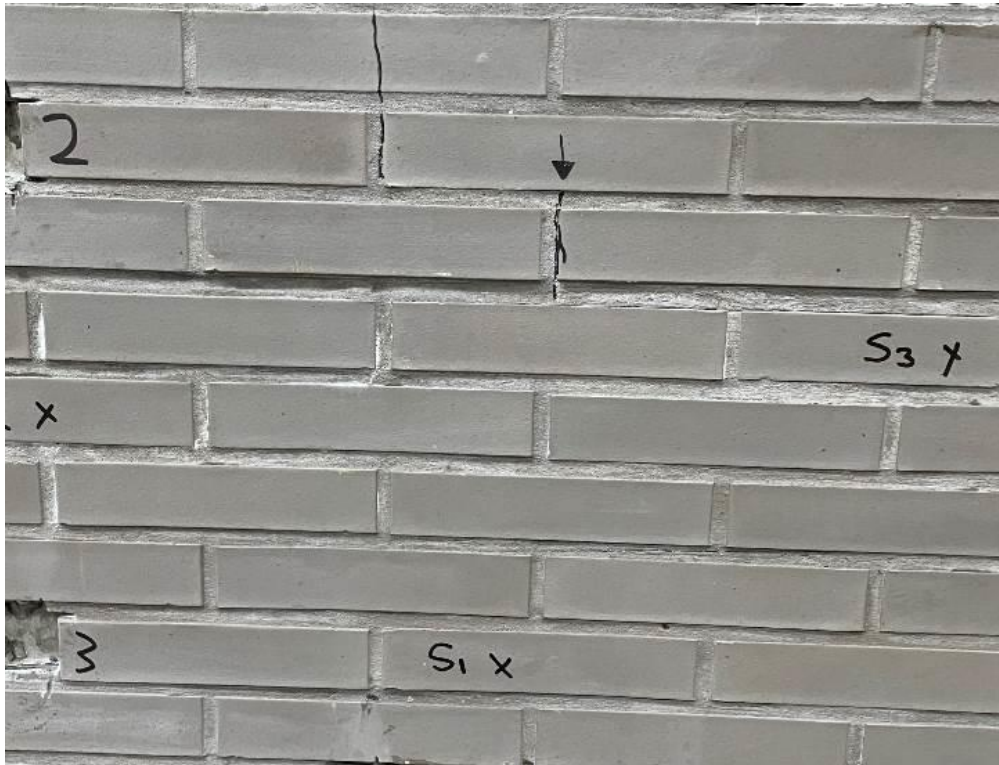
Soft Body Impact of HURST TRACKWALL Brick Slip Cladding System
